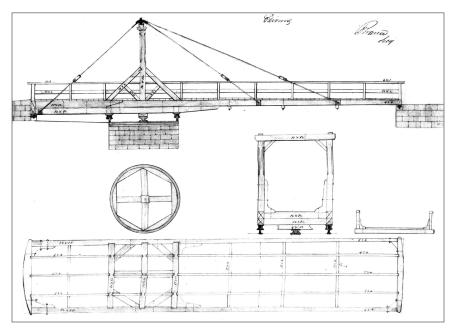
Plan, Elevation & Cross-sections of the Rideau Canal centre-bearing timber swing bridge design prototype of 1866. (Library & Archives Canada, detail of "Rideau Canal, Design for Swing", NMC # 43043, June 18, 1866)
